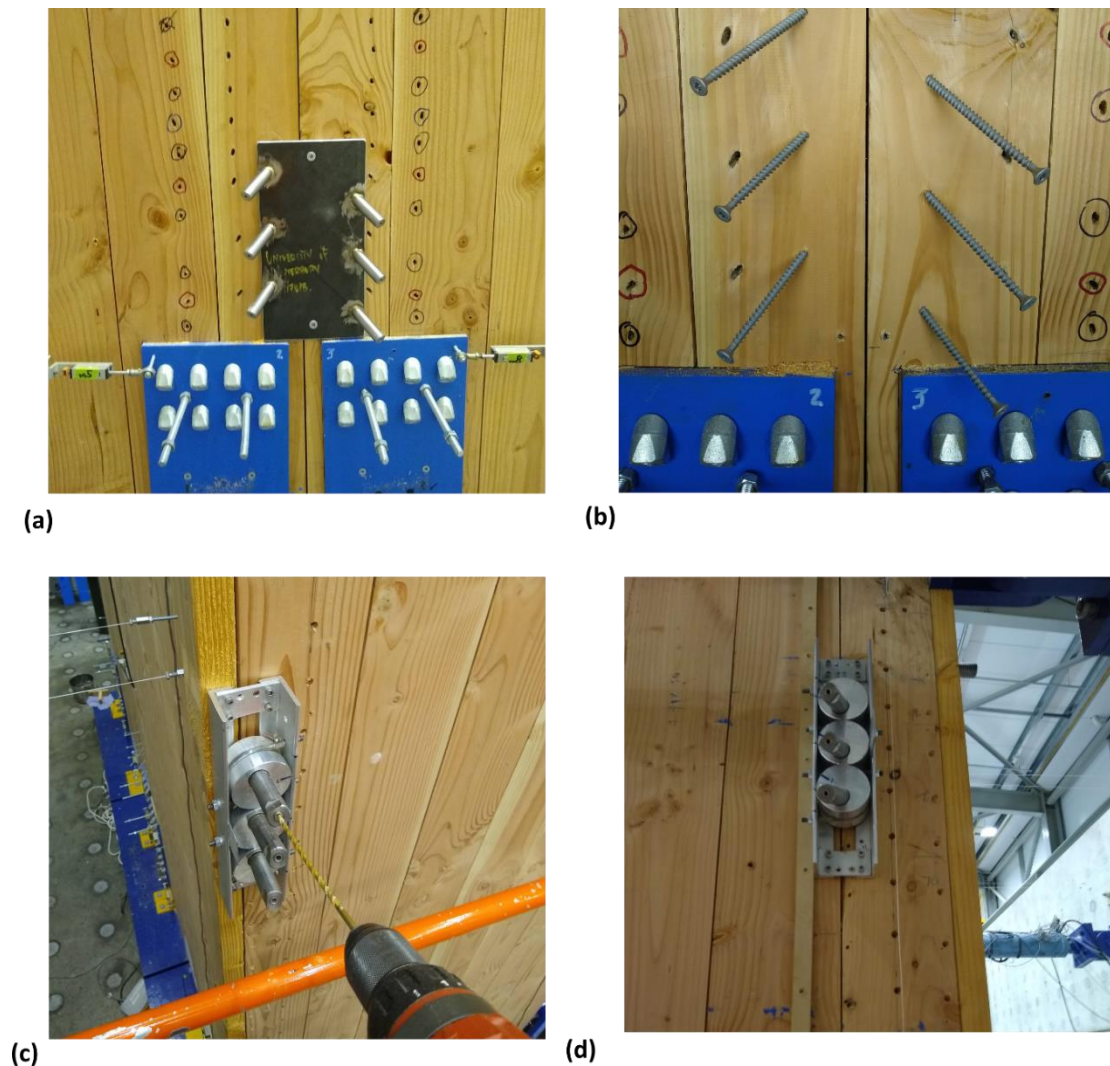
STS installation methodology: (a) and (b) In-plane joint, (c) and (d) orthogonal joint
